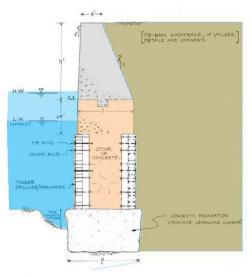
Section of the concrete bulkhead prepared by Meuser Rutledge Consulting Engineers.
